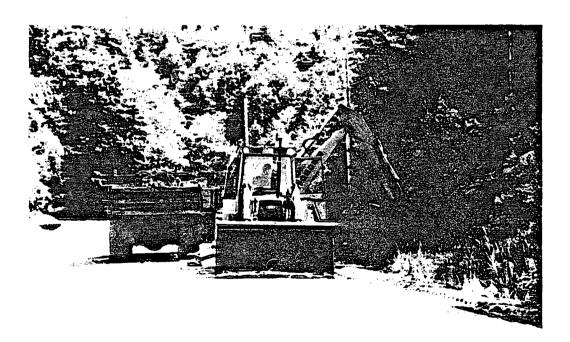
Smaller unpaved road improvement and ditching construction was noticed throughout the watershed.
